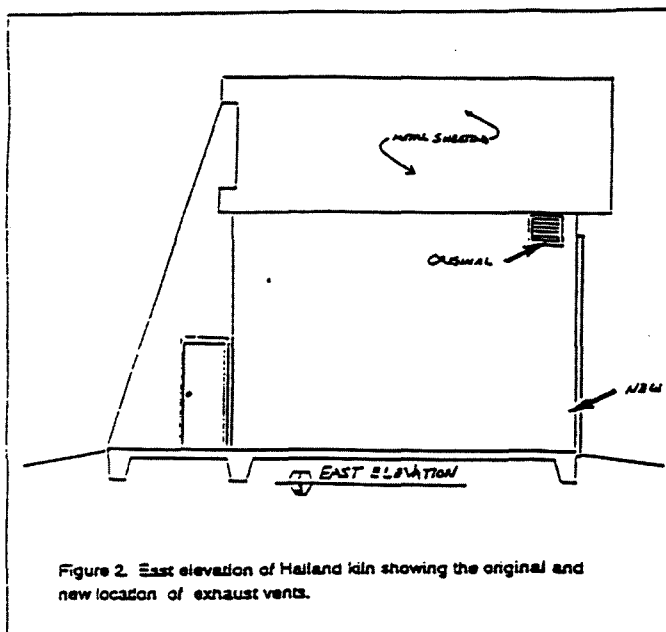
East elevation of Halland kiln showing the original and new location of exhaust vents.
